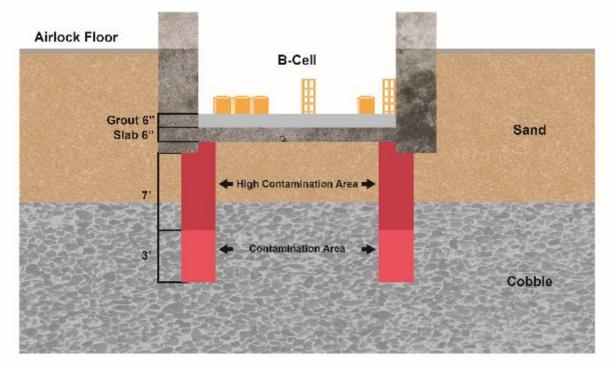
Illustrative cross section of B Cell, grout, concrete slab and the levels of contamination beneath B Cell.
